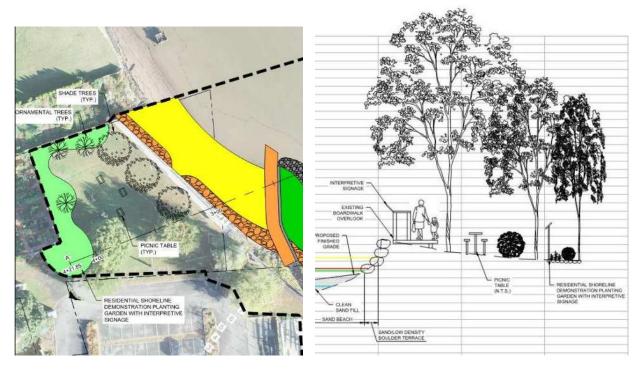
Proposed Demonstration Planting Garden in Parelli Park.
